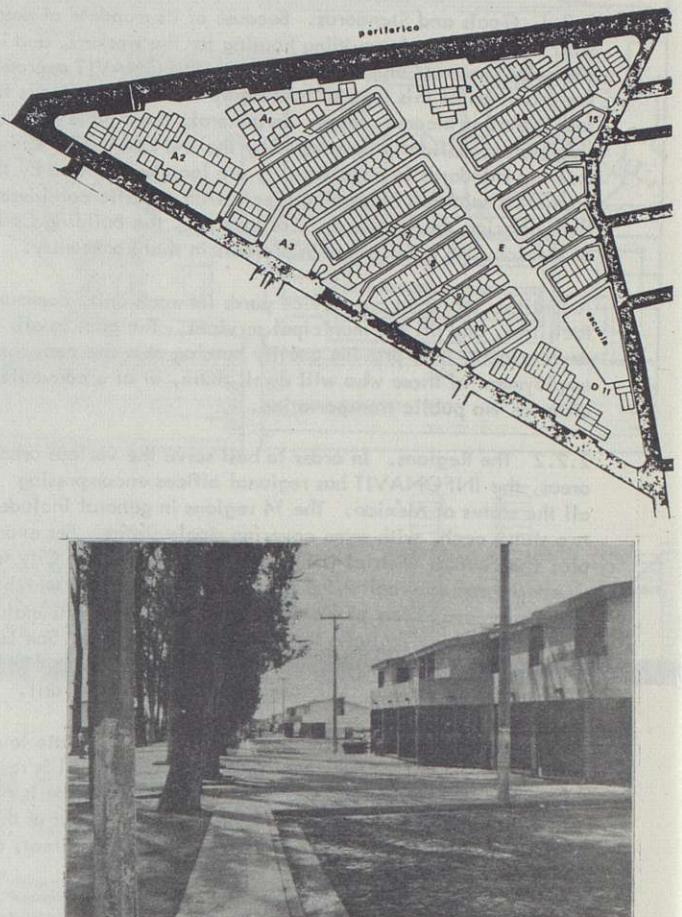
Arboledas de Zapopan (Guadalajara JAL): Site Plan and views.
